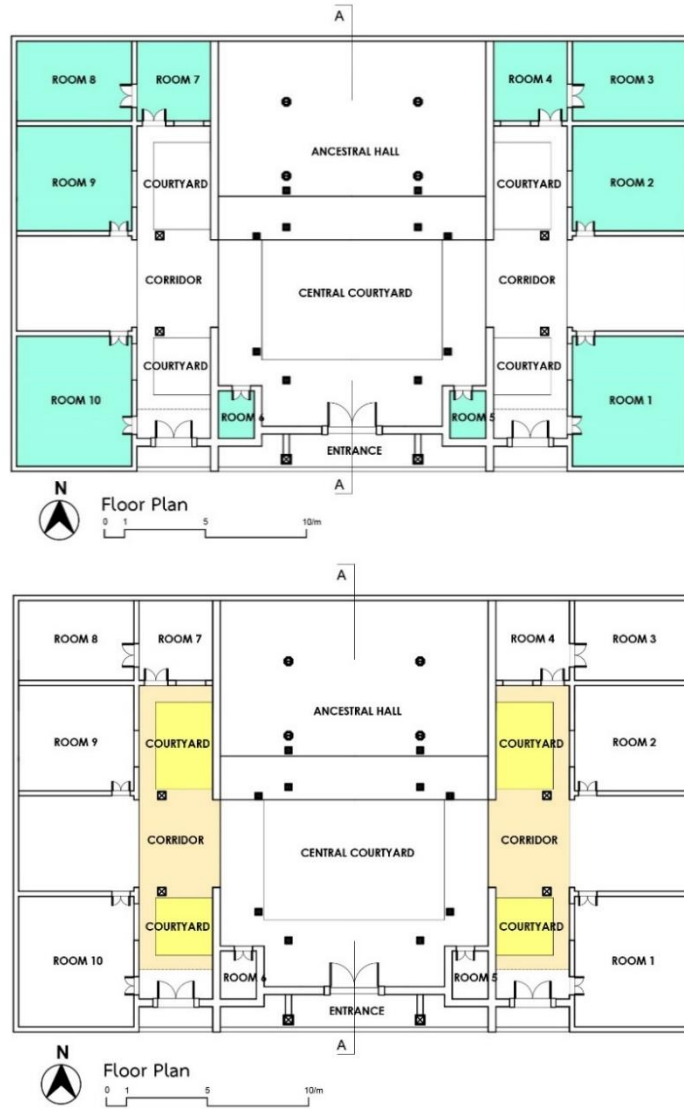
17 The building layout of Tio Chew Ancestral Hall with a building layout of “four golden points”, or “四点金” (Above).
